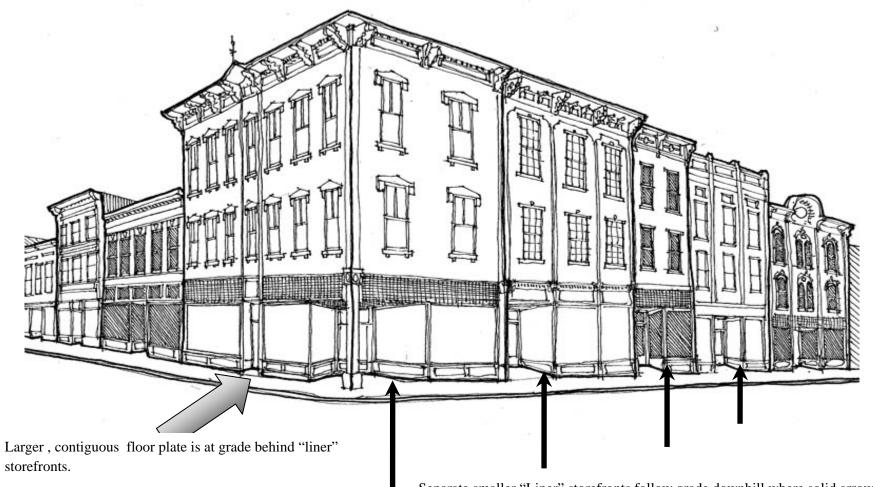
Infill corner buildings should equal amounts of glass facing both streets
